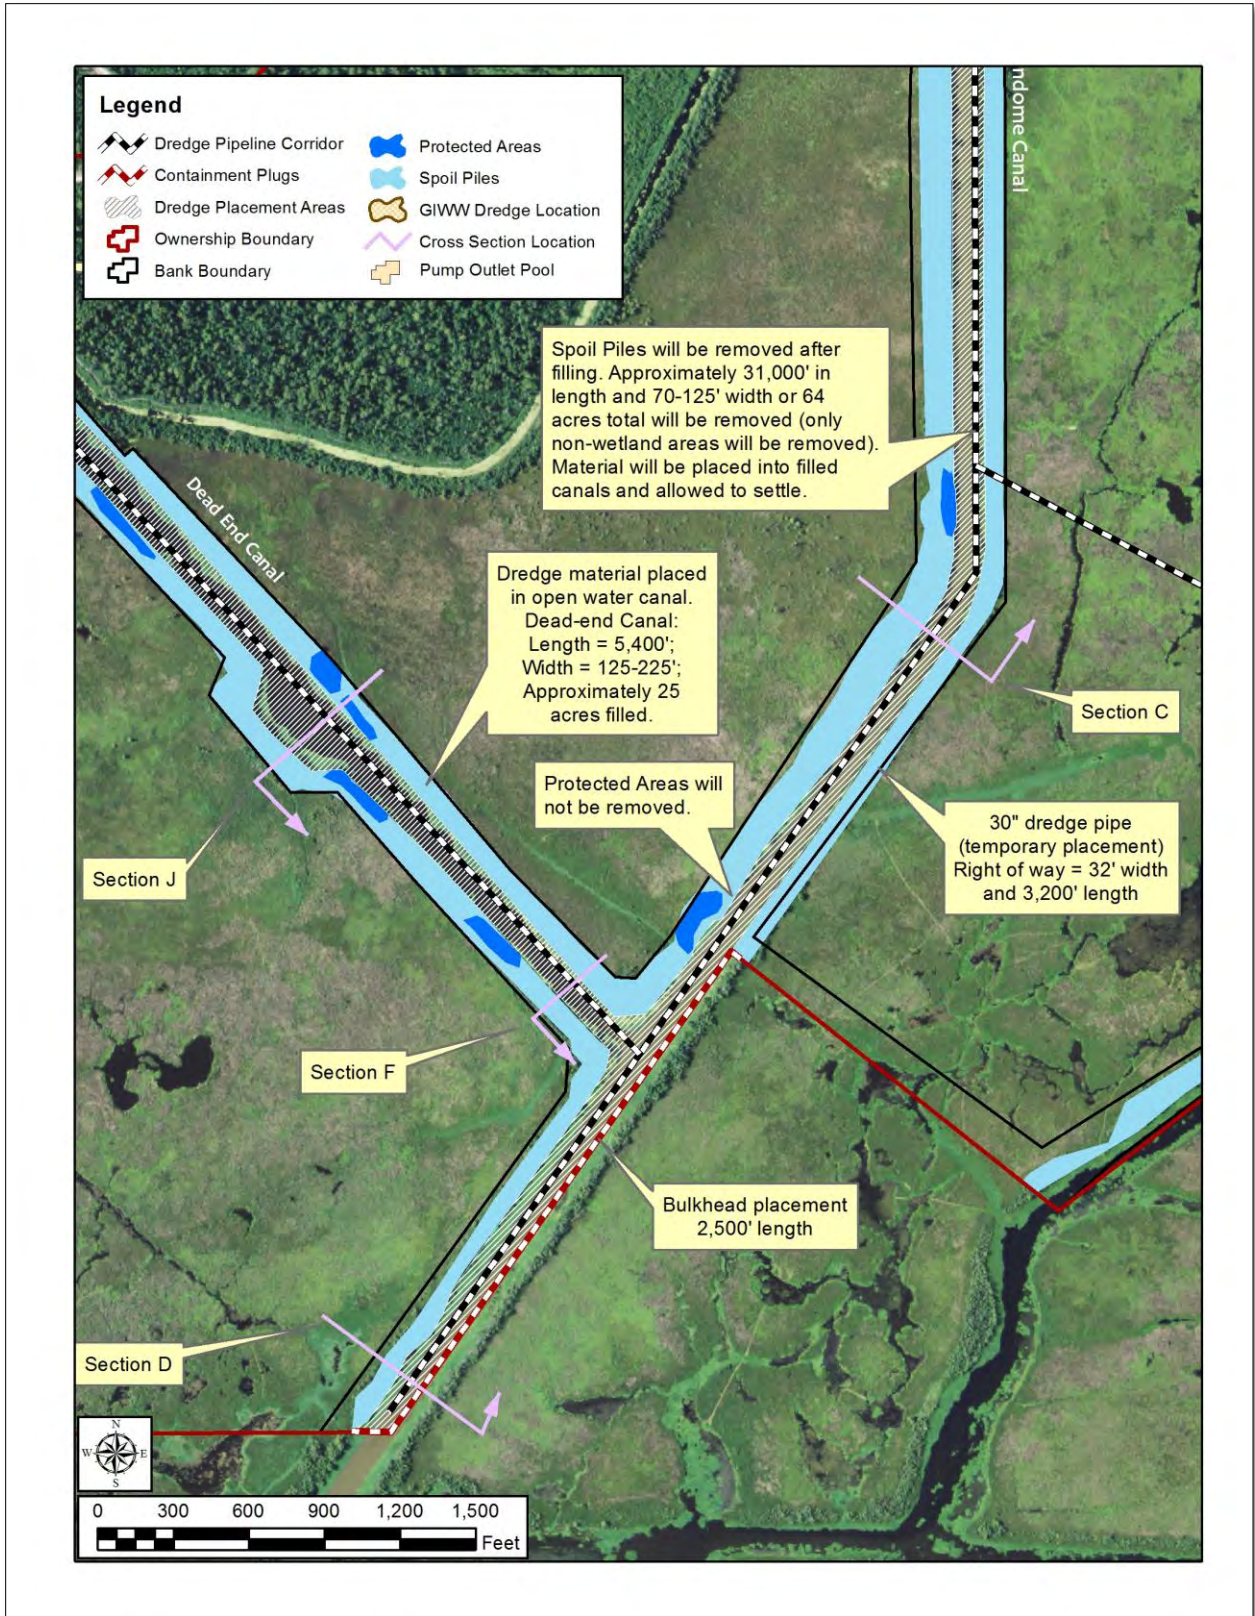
Dredge Placement, Pipe Location, Cross Section Locations, and Spoil Piles.
